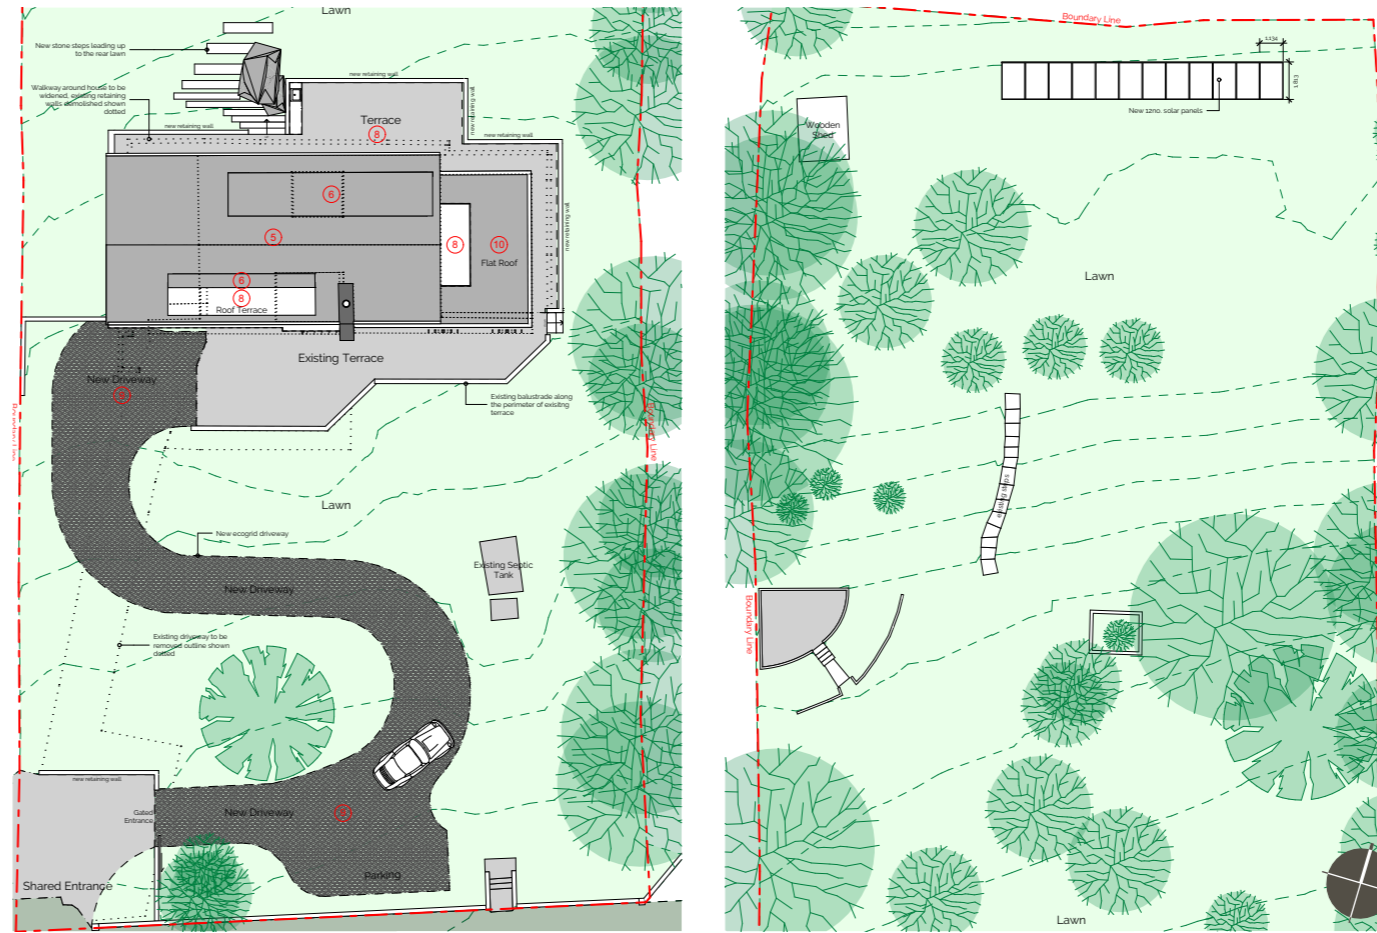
71 Leeson Road Proposed Site Plan - not to scale
